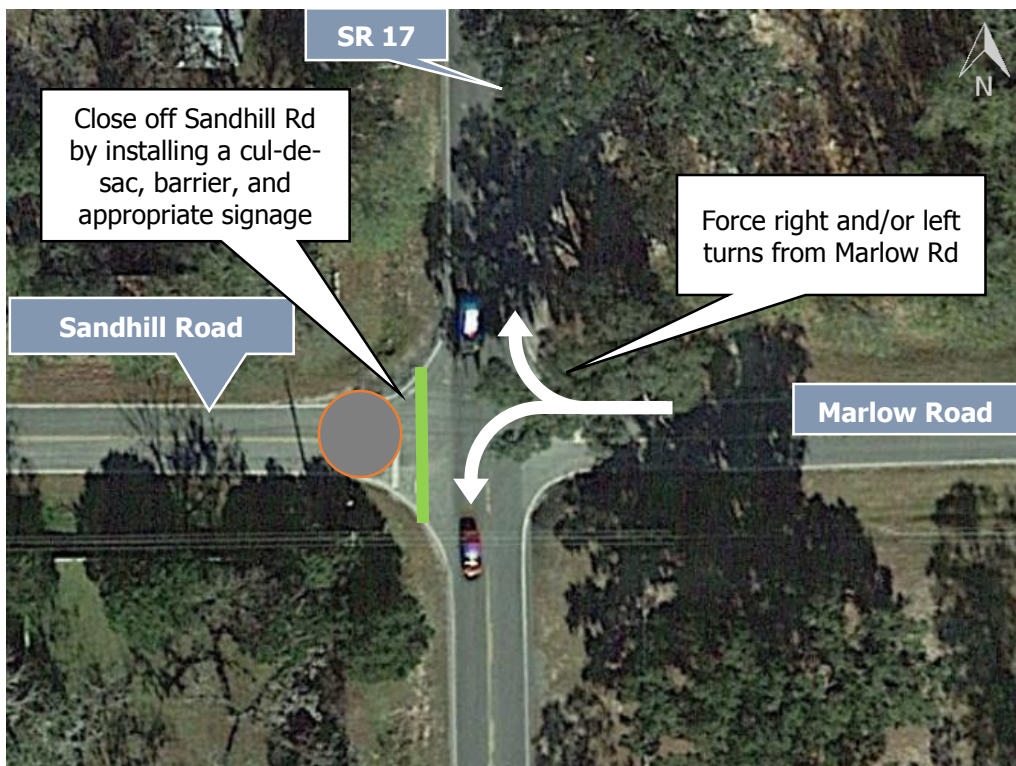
SKETCH DIAGRAM OF RECOMMENDED CUL-DE-SAC ON SANDHILL ROAD
